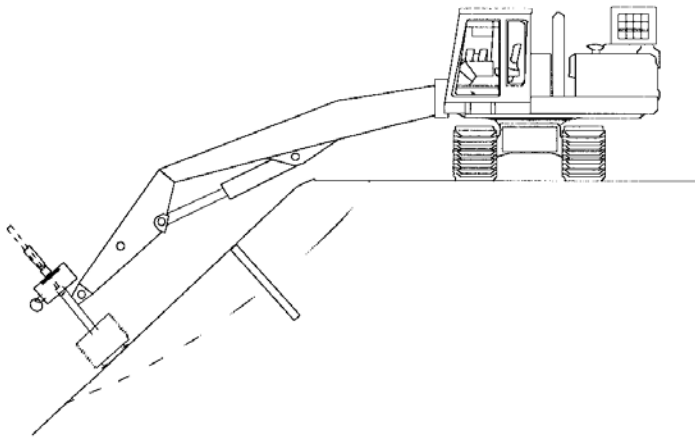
A SOIL NAIL LAUNCHER MOUNTED ON AN EXCAVATOR INSTALLING NAILS ON AN UNSTABLE FILL SLOPE BELOW A ROAD. TAKEN FROM (USDA FOREST SERVICE, 1994).
